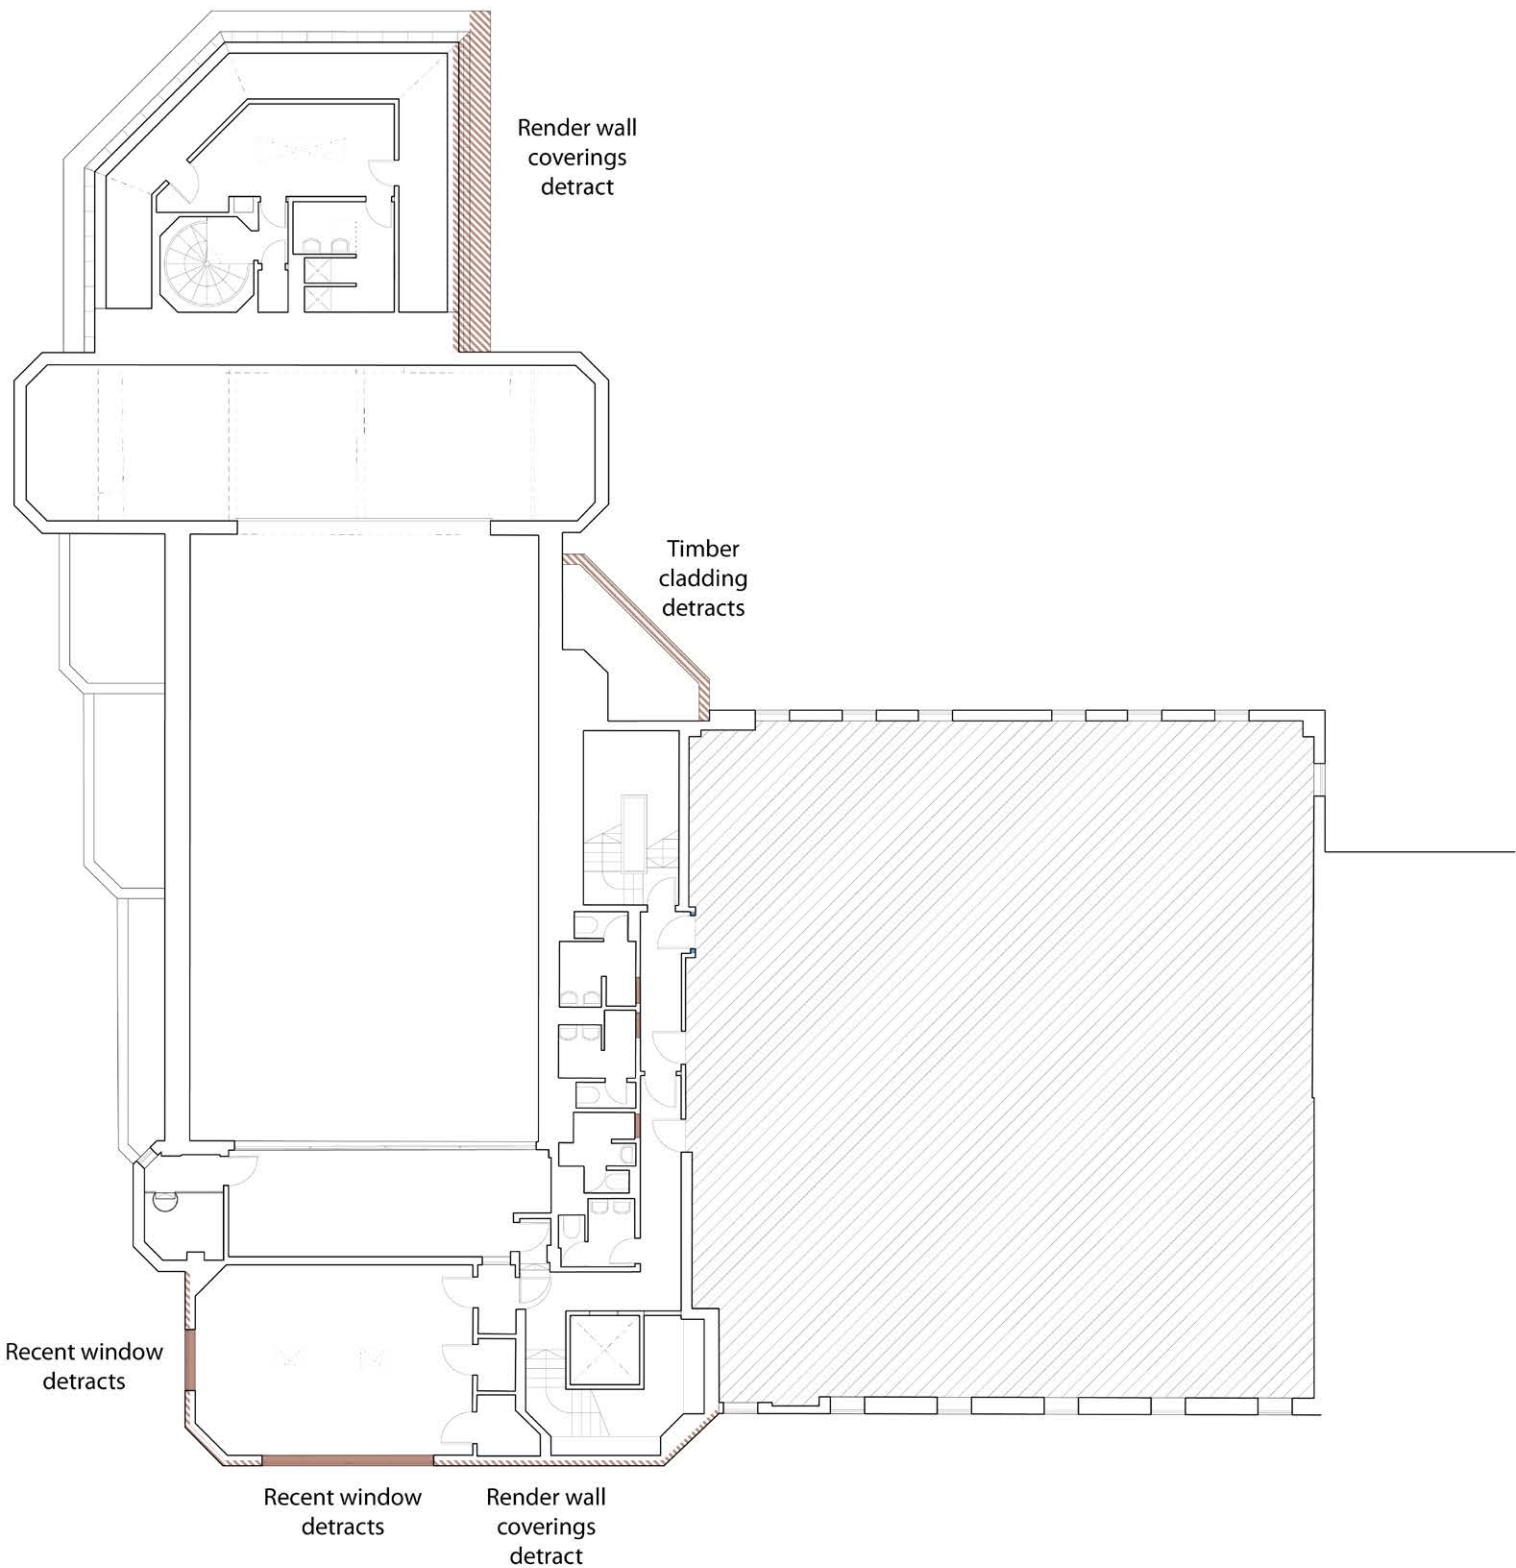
Second floor detracting fabric [Ian Chalk Architects]
